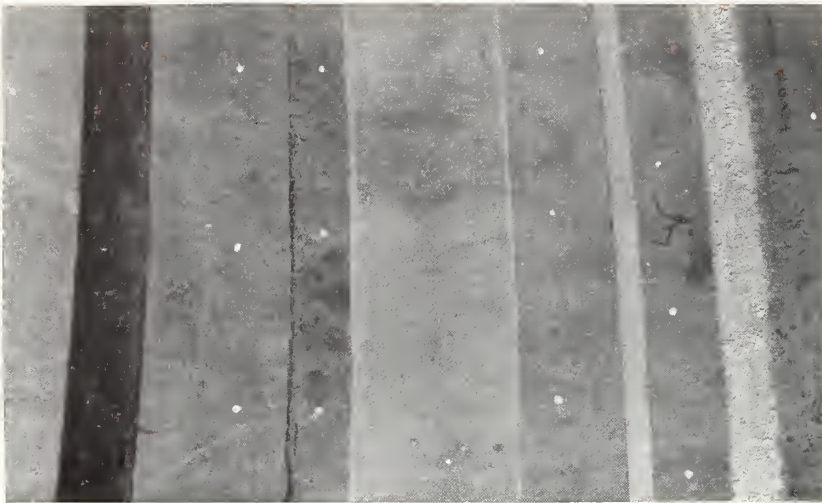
$\frac{3}{4}$ -in. magnesium-orychloride monolithic composition on concrete subfloor (test panel 12L).
